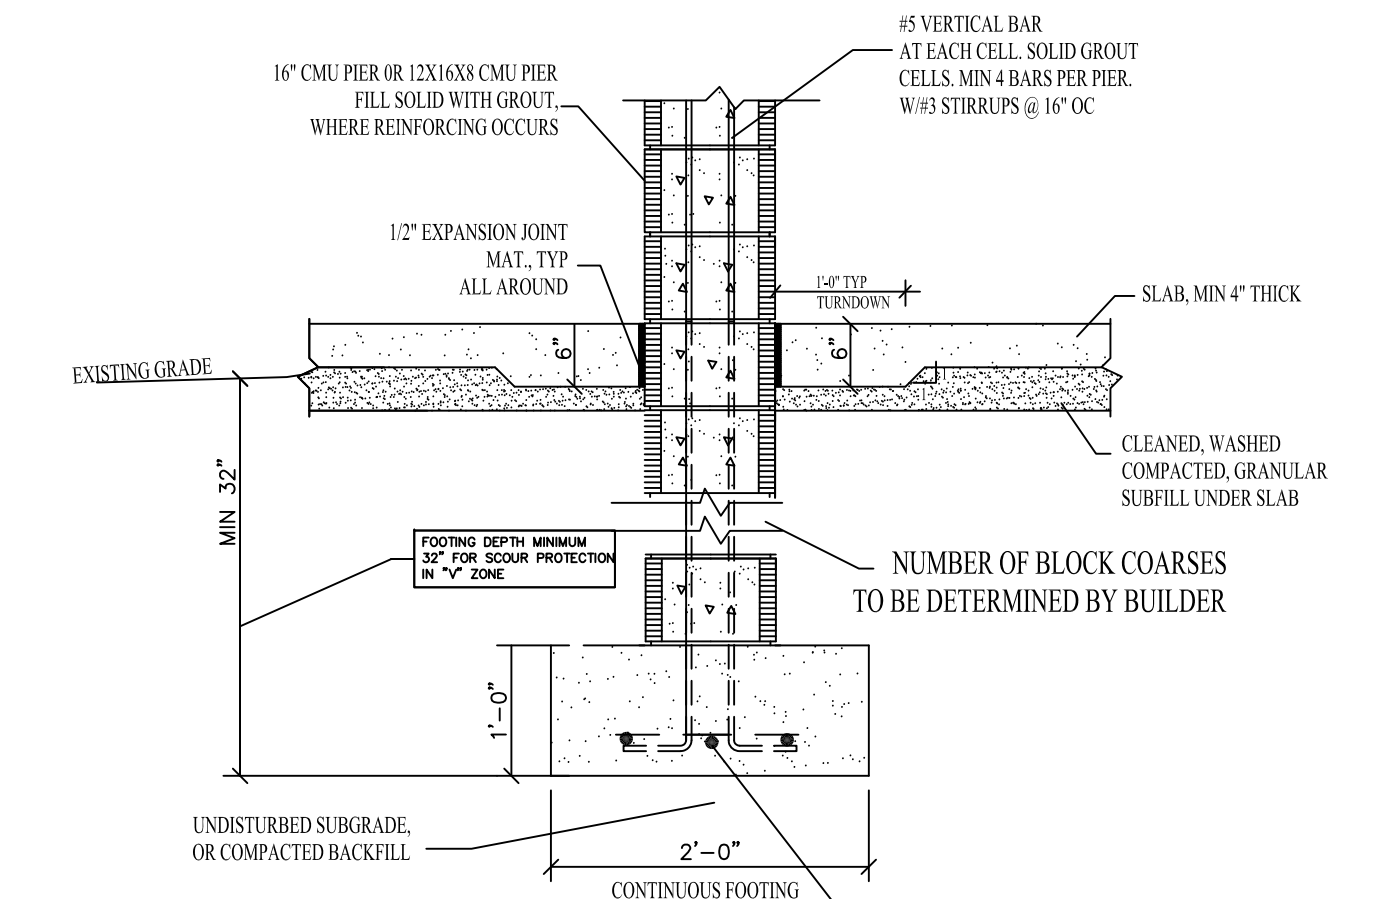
" TYPICAL EXTERIOR WALL SECTION
